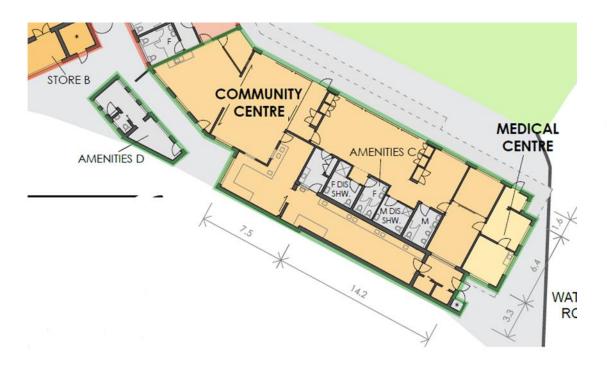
Proposed floorplan for Harry Jensen Community Centre, outlined in green
